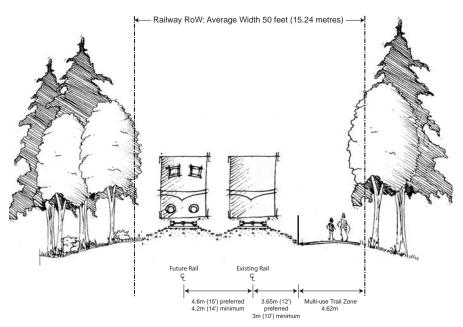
15 metre (50 foot) corridor showing minimum and preferred separation of rail and trail uses.
